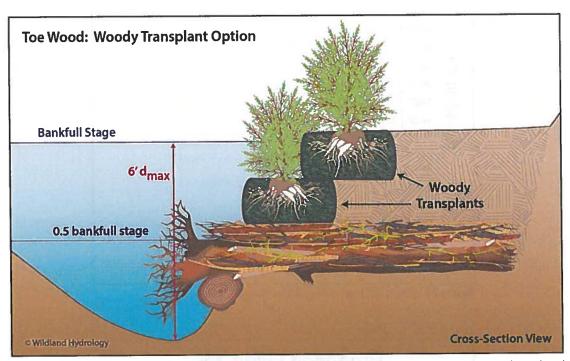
Design details of toe wood on a typical pool cross-section for providing instream and overhead cover for habitat enhancement. Note the undercut bank and transplanted woody vegetation on upper half of bank.
